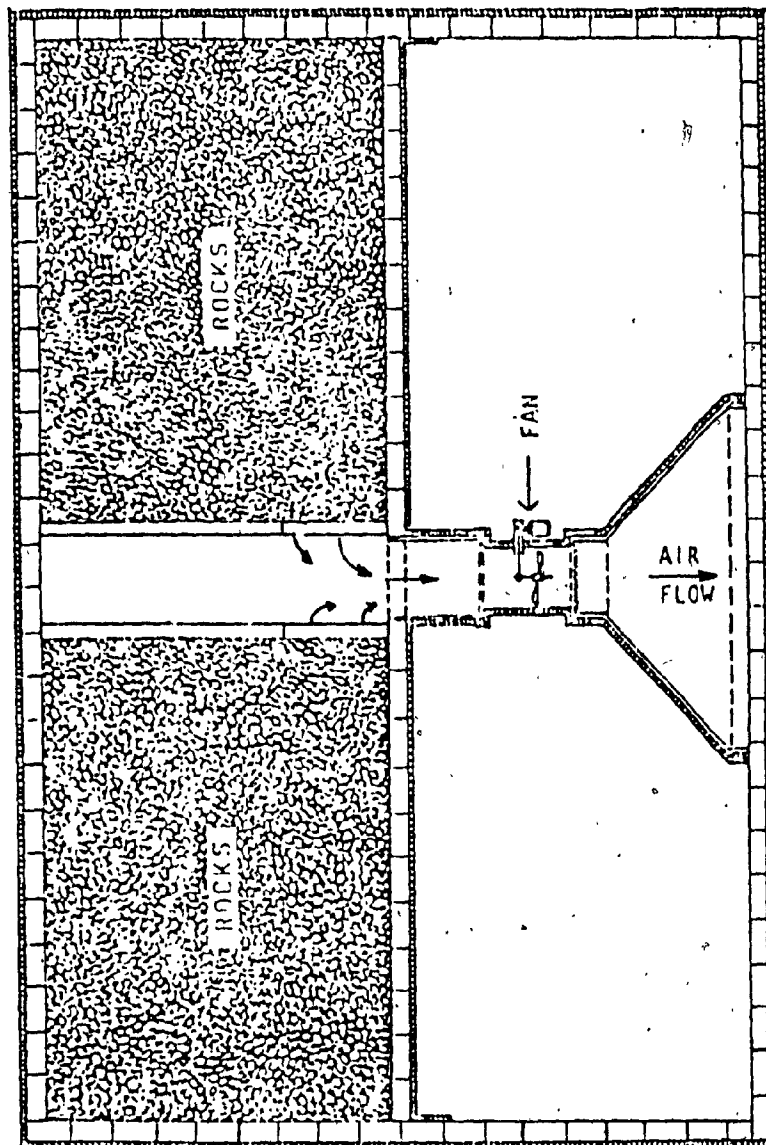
PLAN OF HOUSE AT LA MACAZA - STORAGE LEVEL [ADAPTED FROM REF. 2]
